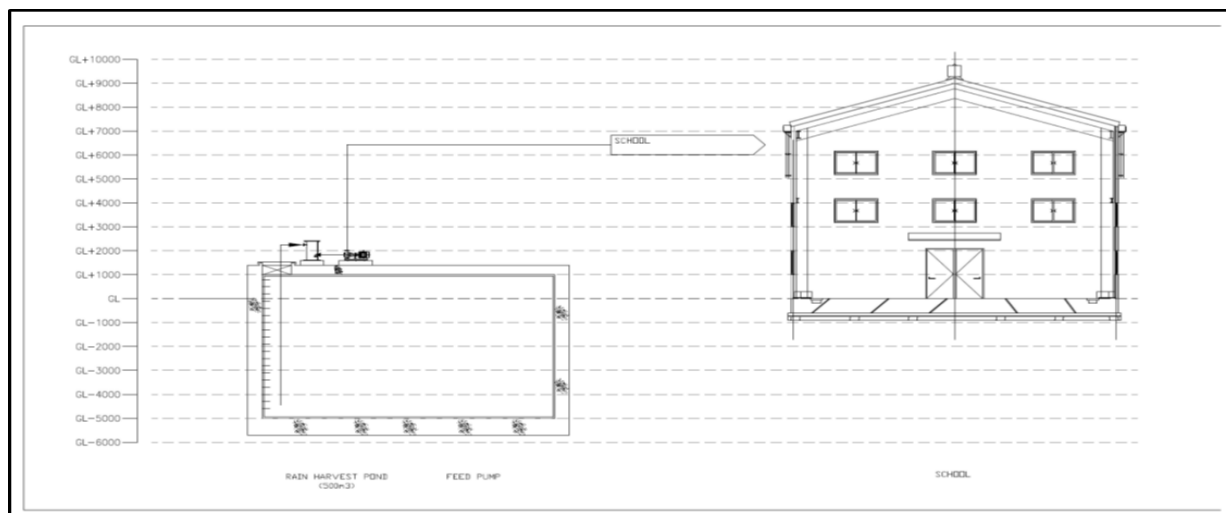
Typical section drawings of Proposed Rainwater harvesting system
